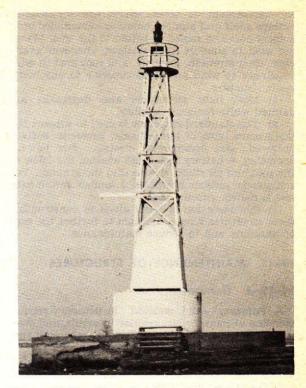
Steel skeleton minor light structure on concrete-filled steel shell on concrete foundation.
